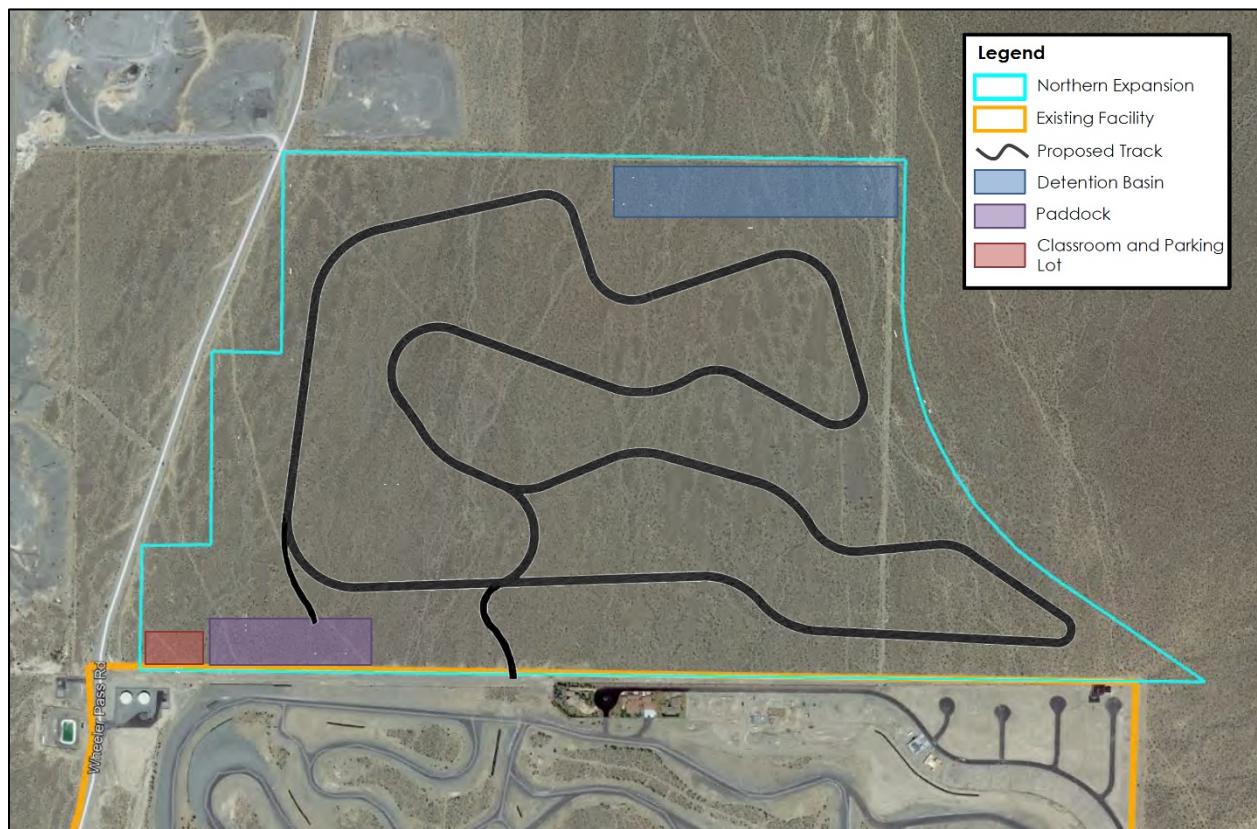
Proposed SMR expansion area showing locations of proposed facilities.
